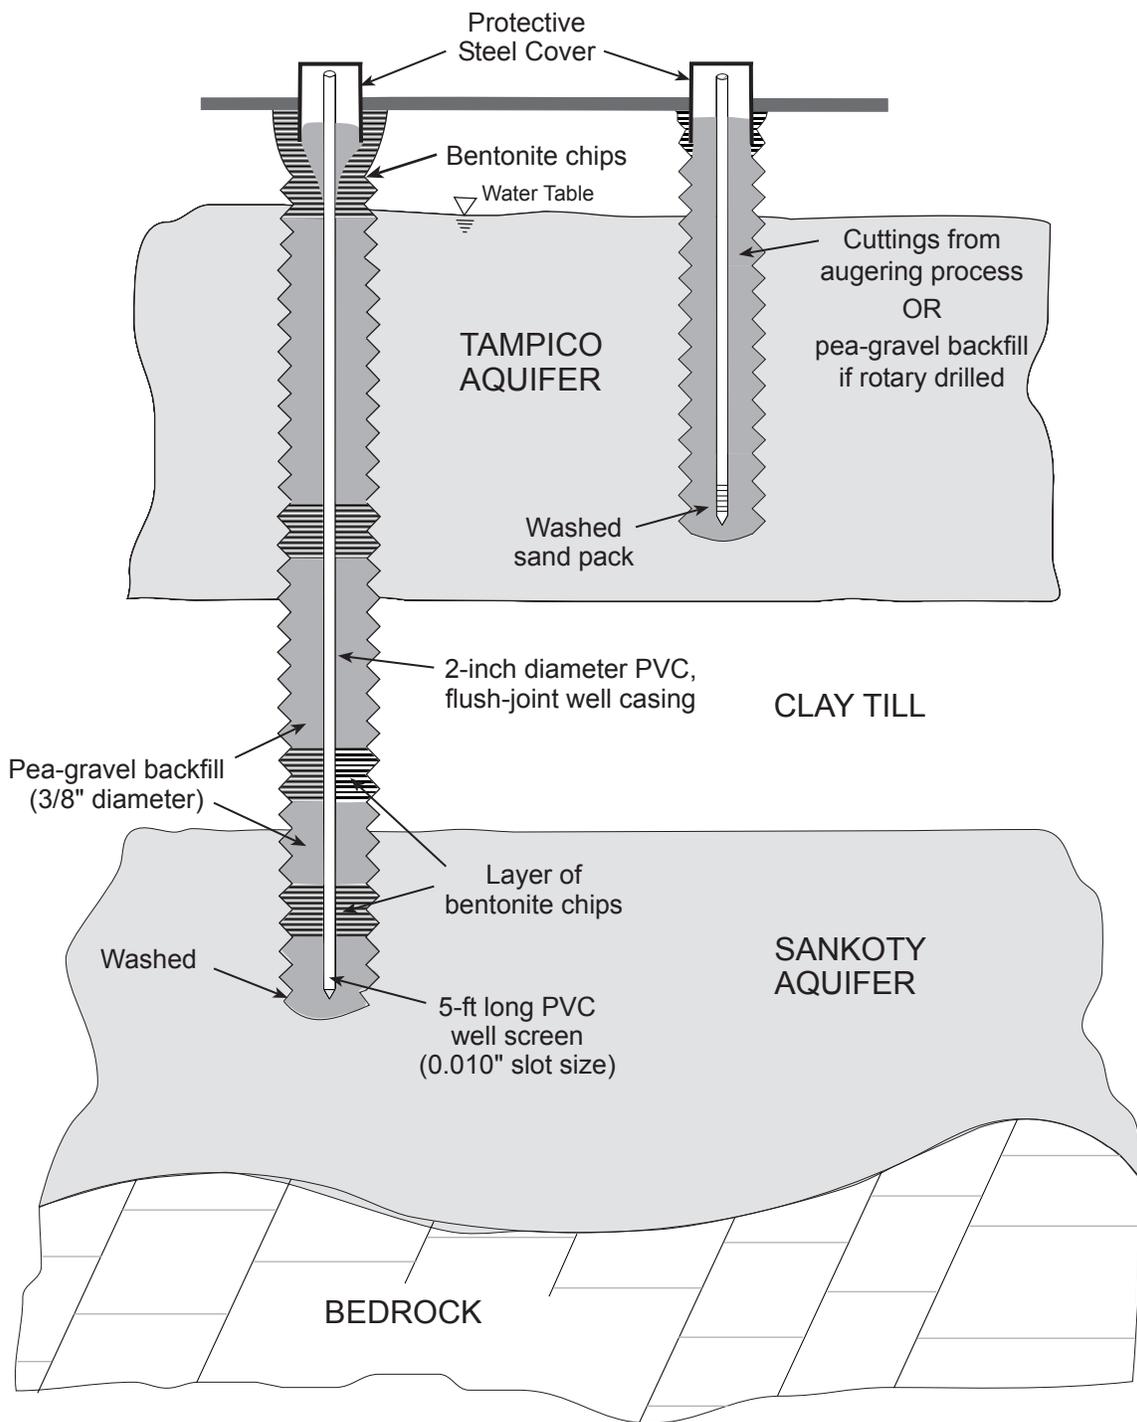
Cross section of typical observation well construction and example of "nesting" wells at one site
